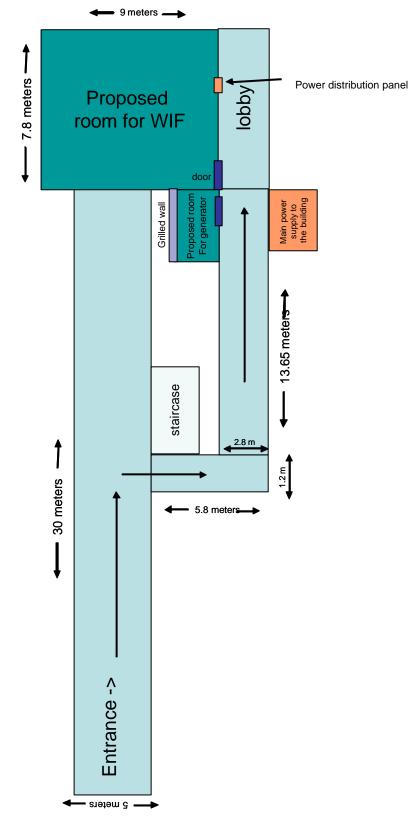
Layout of Meerut cold store facility (ground floor) and suggested locations for the new WIF
